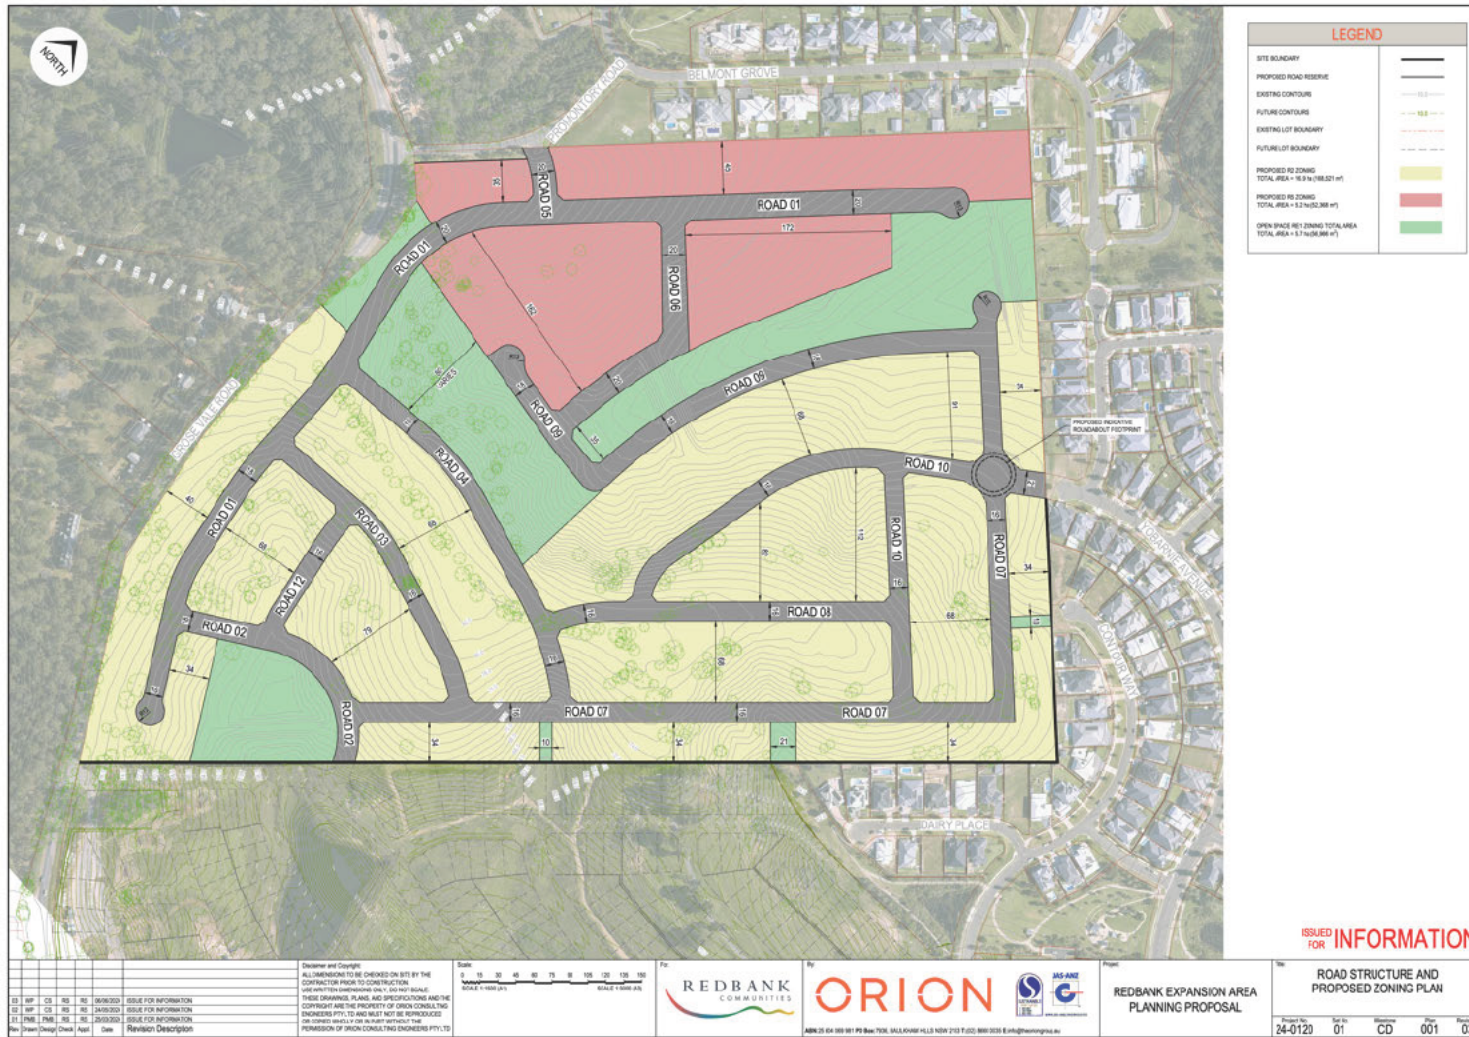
Redbank 'Kemsley Park' Structure Plan
